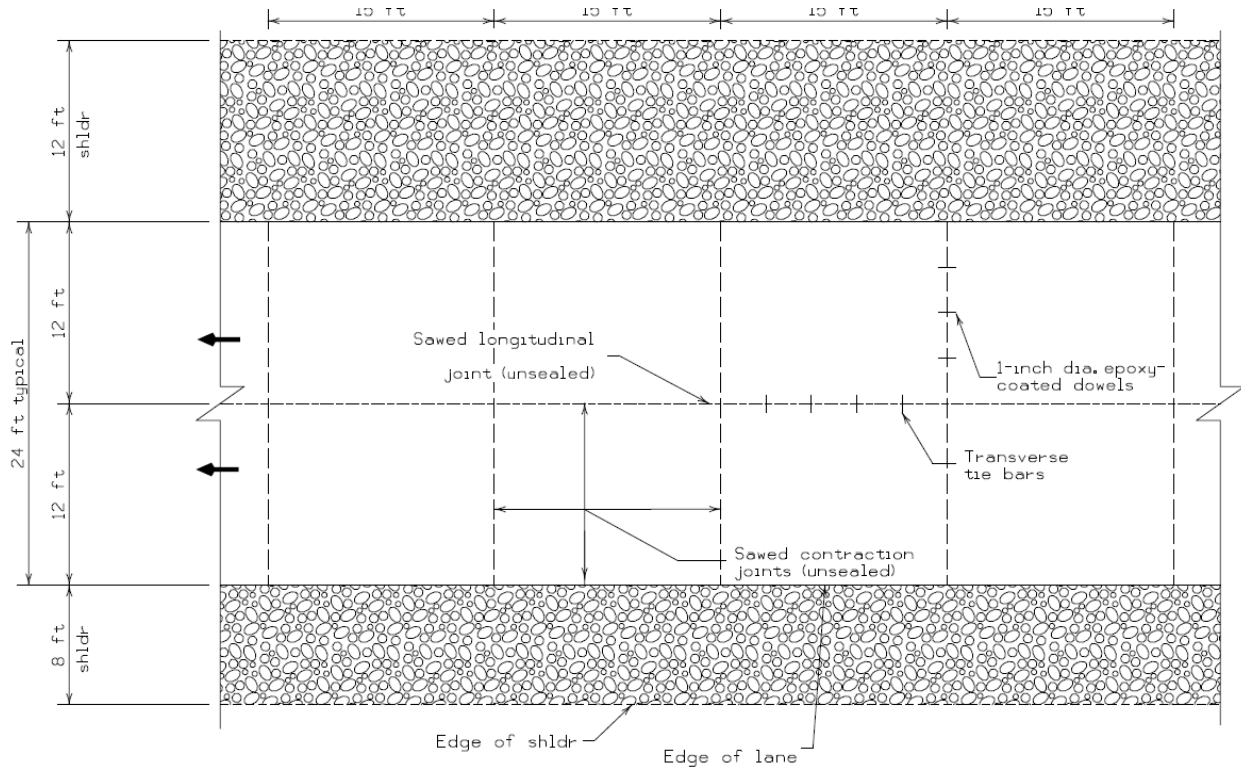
Concrete pavement joint plan for early opening experiment (Cells 124-624).
